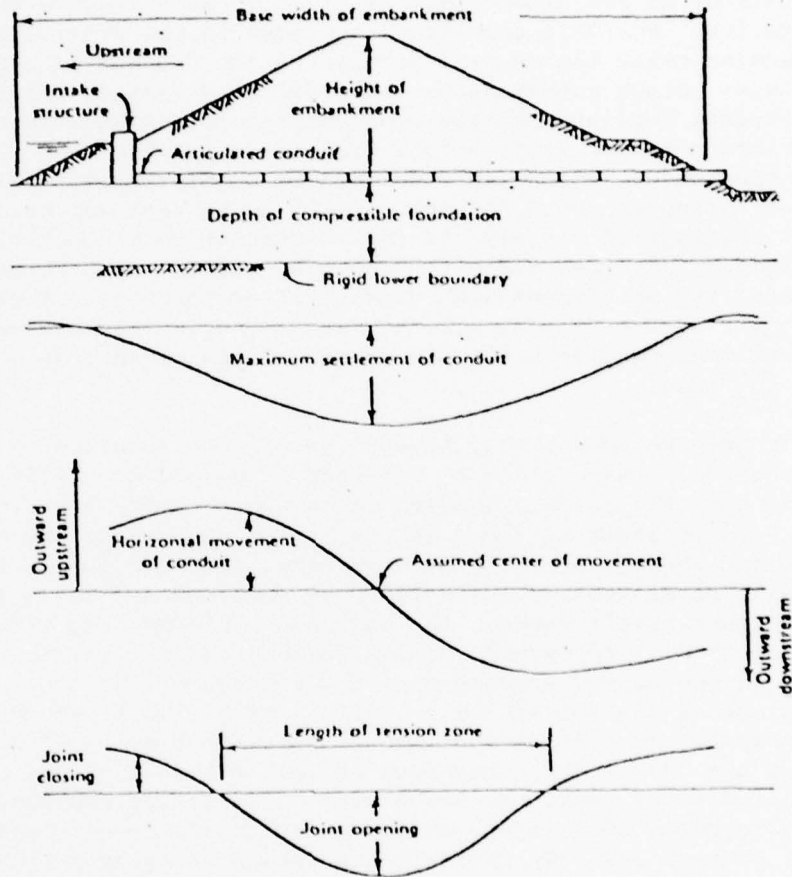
CONDUIT MOVEMENTS BENEATH AN EMBANKMENT ON A COMPRESSIBLE FOUNDATION
